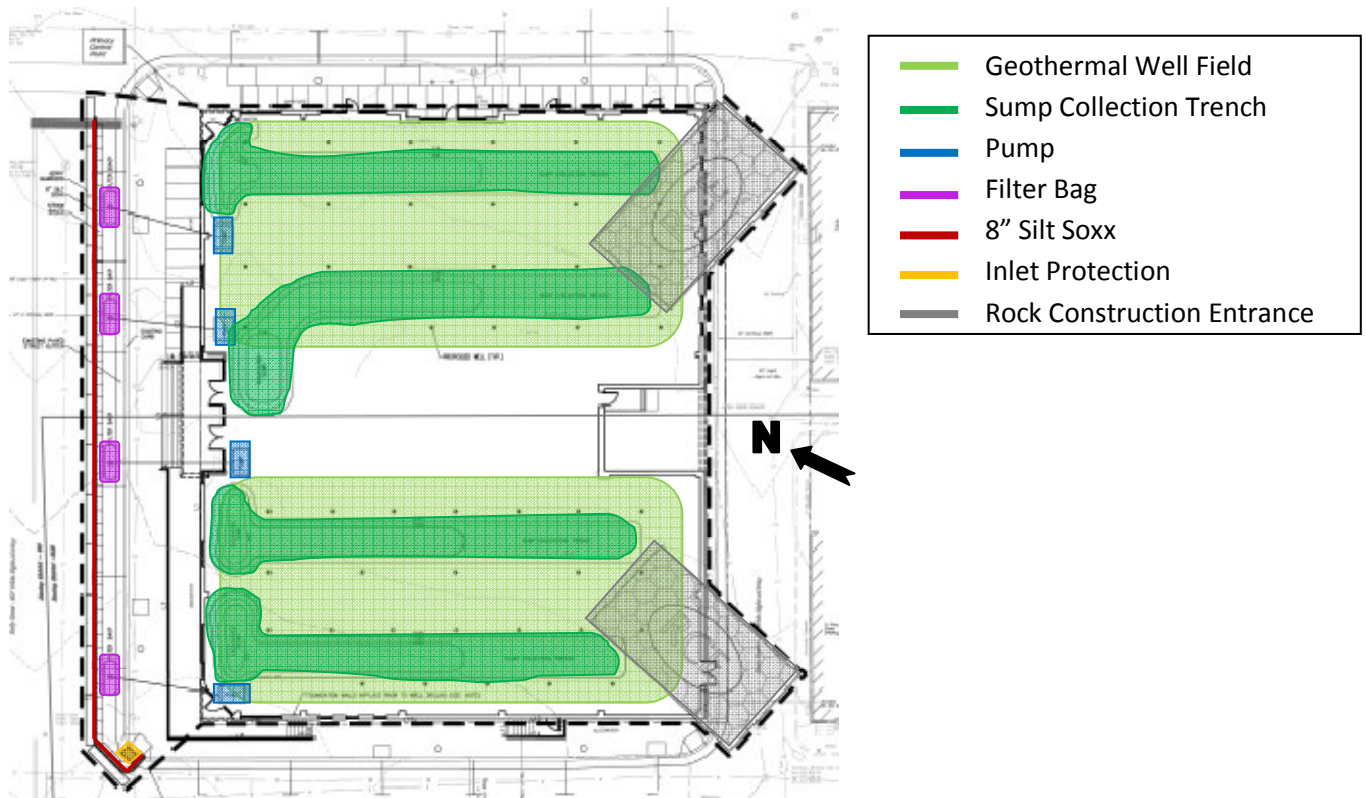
E&S Plan Drawing provided by Wohlsen Construction Company
